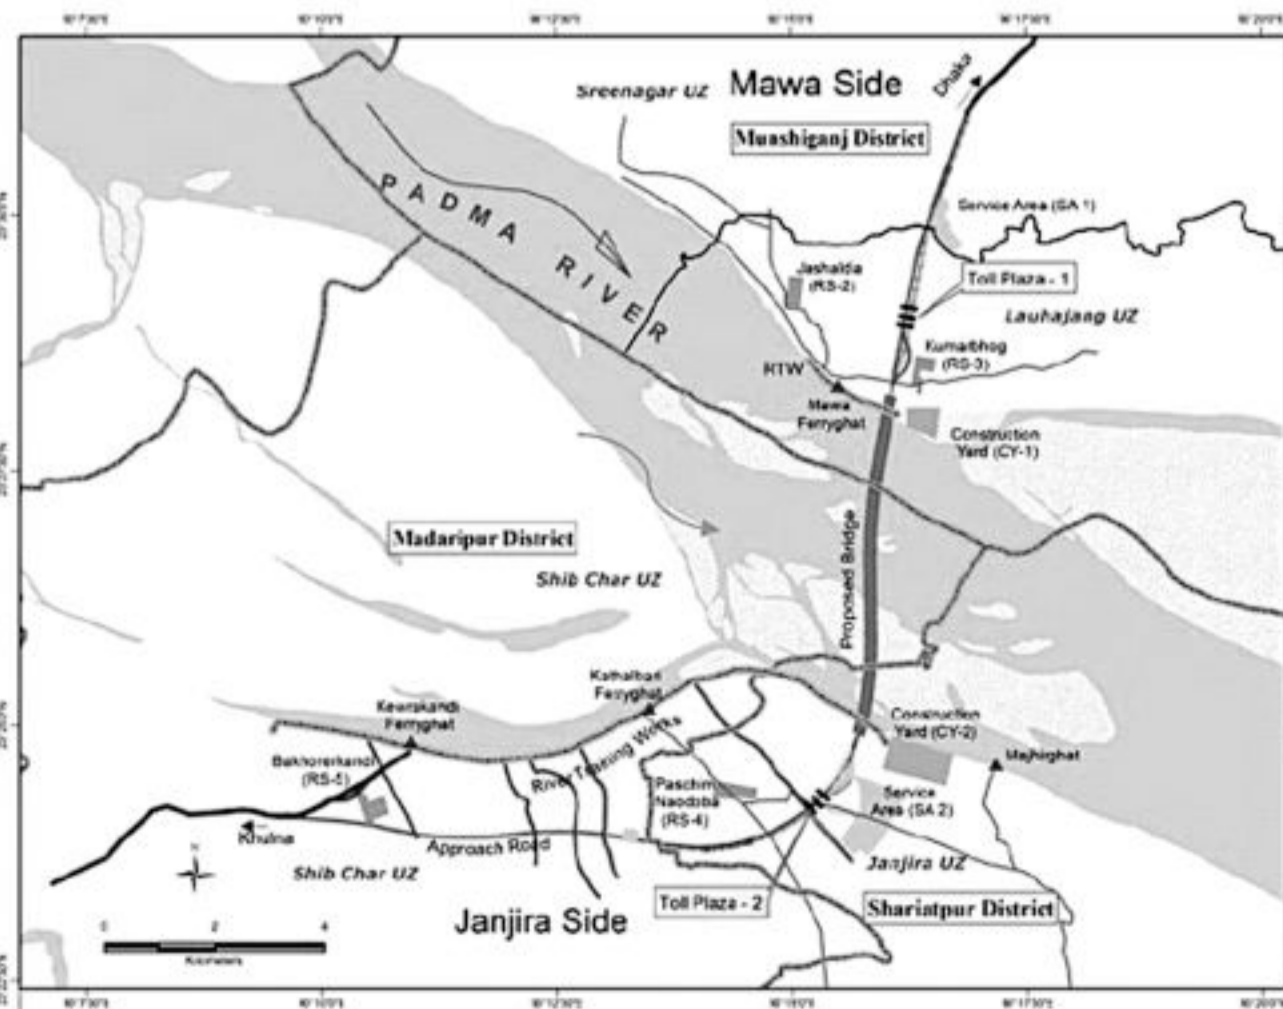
The Padma Bridge layout and its approach road (Maunse//AECOM)
